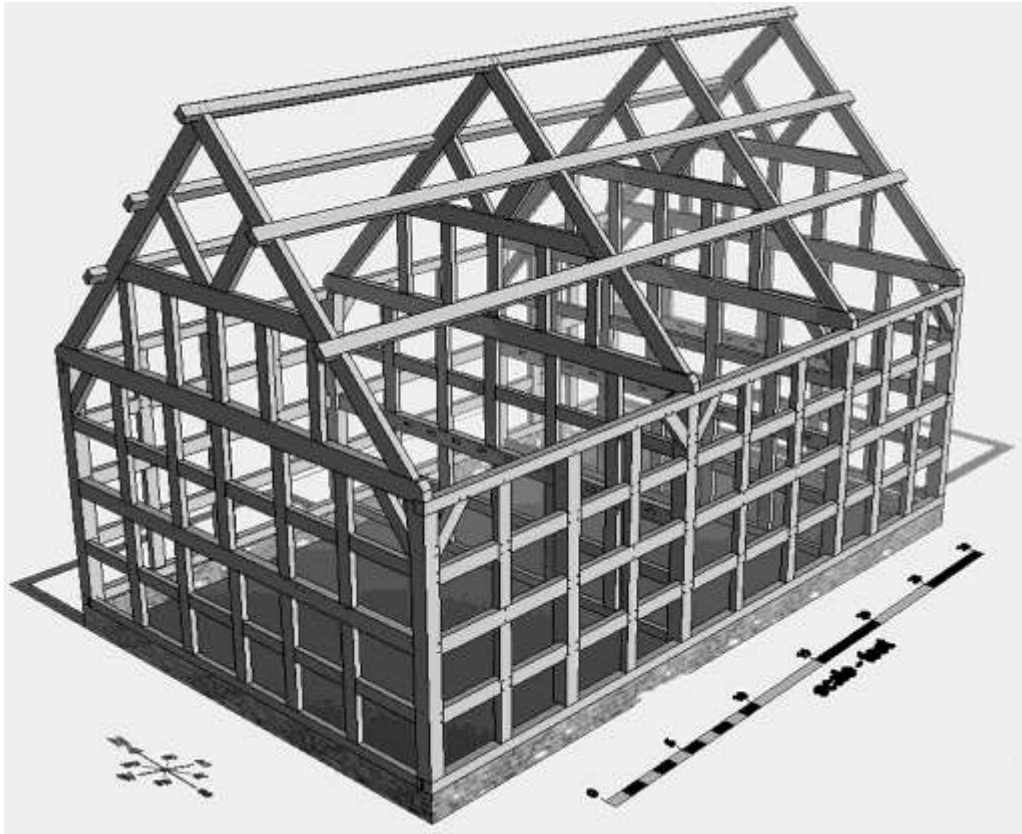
Shop Cottage, Monkland. Reconstruction drawing showing the basic frame layout. Details of the exact form of the roof are lost and there is no evidence in the frame to indicate the primary door and window positions
